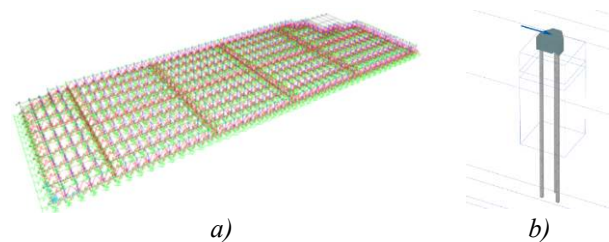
a) Foundation's structure 3D SAP2000 finite element model. b) Pile Plaxis 3D finite element model.
